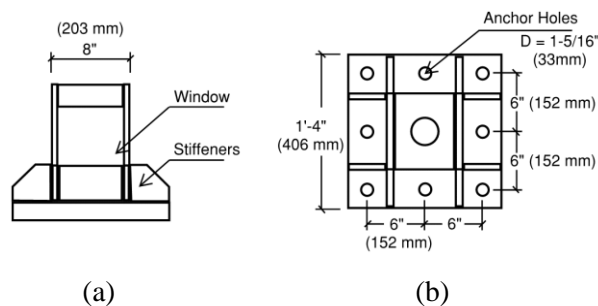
Base plate assembly. (a) elevation and (b) plan view
